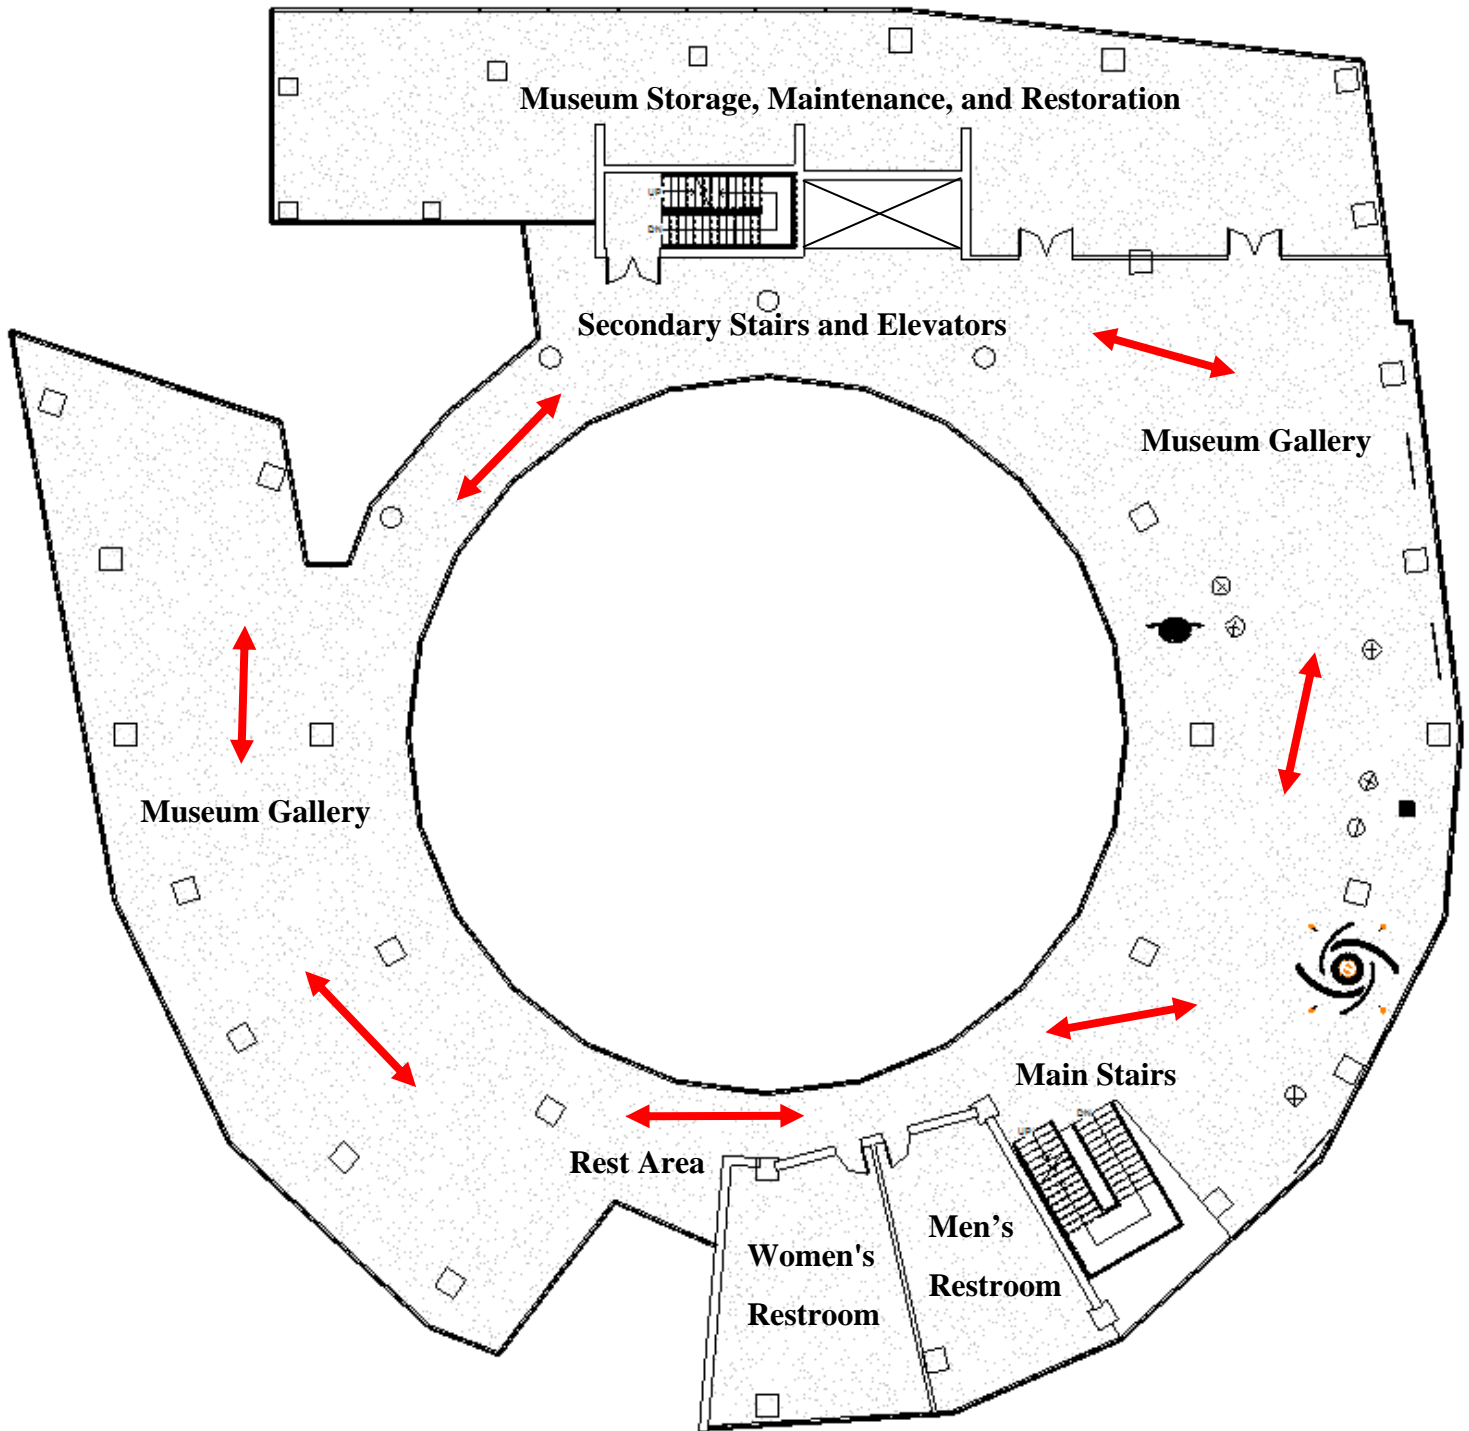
A typical floor plan for the Gateway Museum. Red arrows show the circulation paths for visitors.
